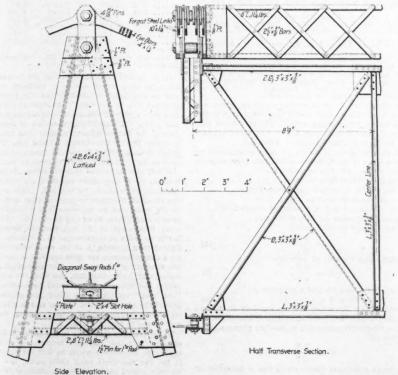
CENTER TOWER CONSTRUCTION FOR GRAND TRUNK RY. BRIDDE OVER THE TRENT VALLEY CANAL.
